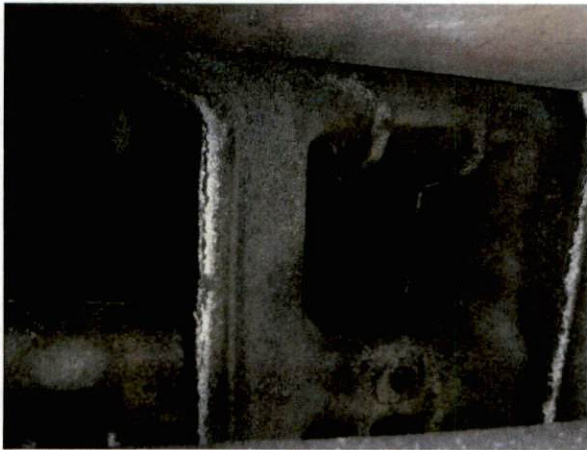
View of HA 5, asbestos-containing boiler rope gasket.
